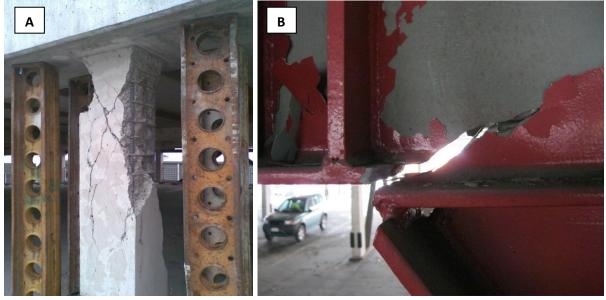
(A) A spalled concrete column inside the Christchurch Hospital car parking building. (B) Cracking in car parking building K beam (Bavis 2011).
